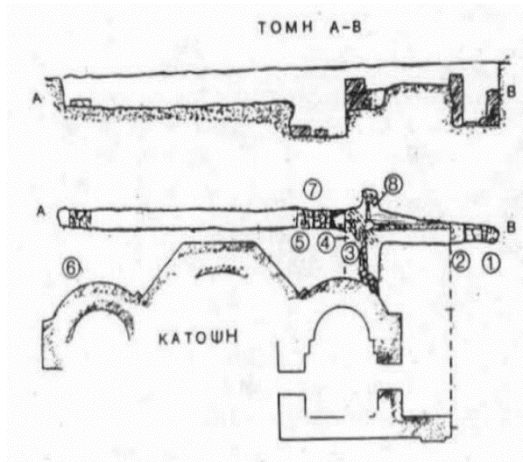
Building and floor east plant of the Church (Pitilakis D.)
